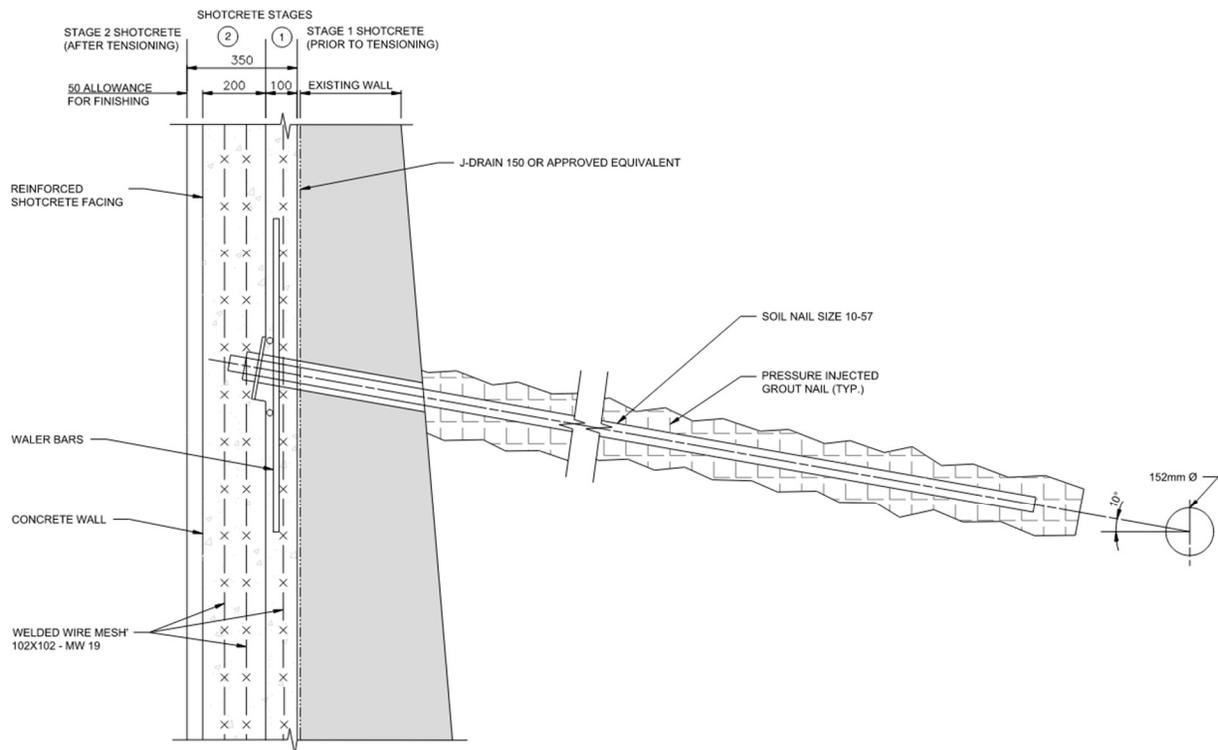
Bid Phase (Preliminary) Abutment Wall Thickening and Soil Nail Detail
